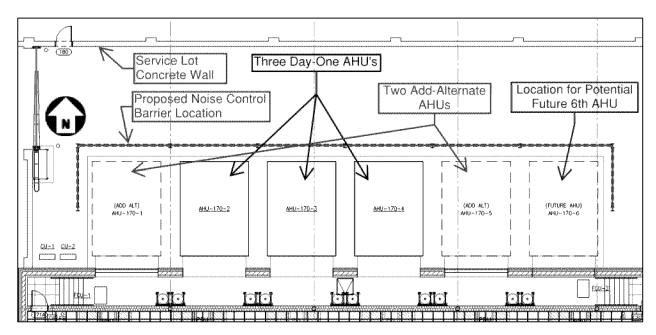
Partial plan view showing the layout and location of the proposed barrier wall.
